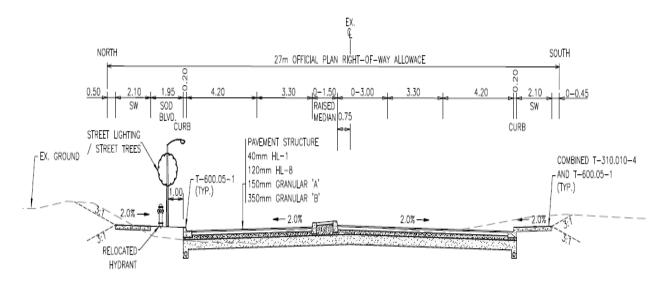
Alternative Design 4A: Typical Cross Section at Markham Road
